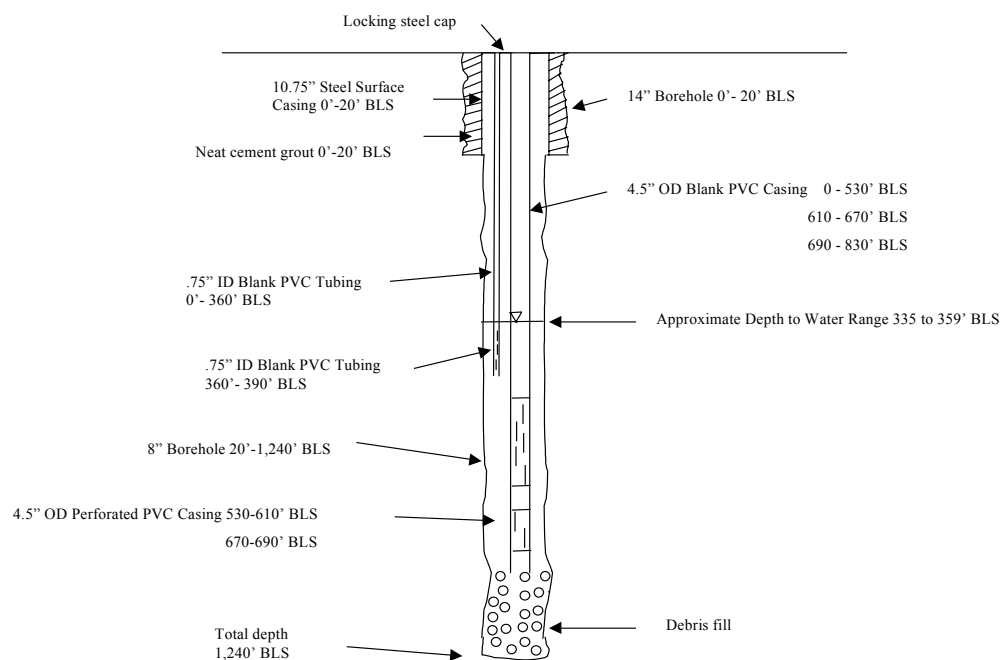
As-built well construction drawing for B(15-2) 22AAB
